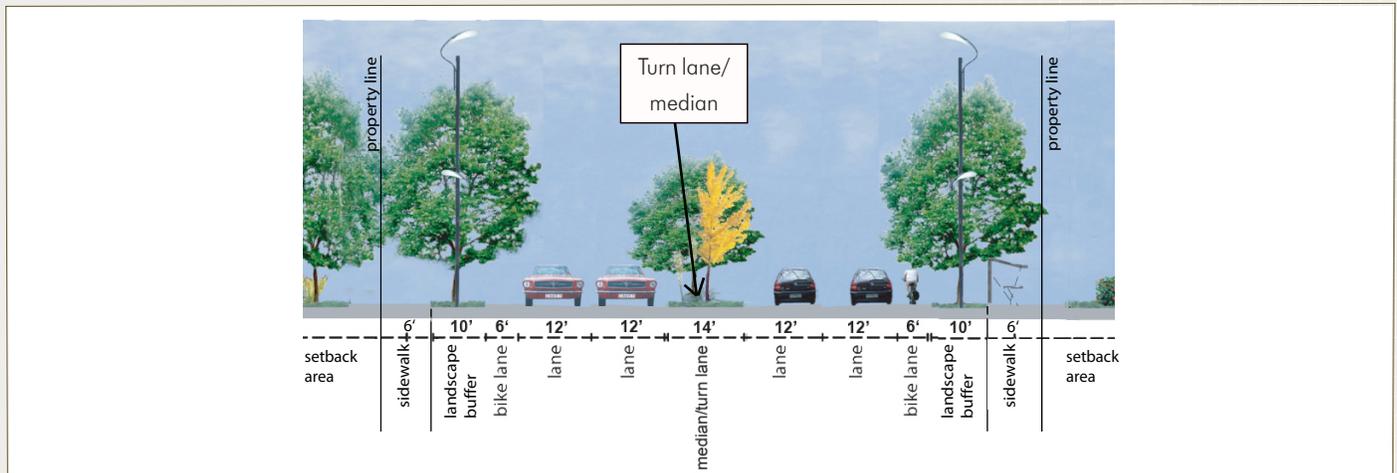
PONDEROSA DRIVE EXTENSION
